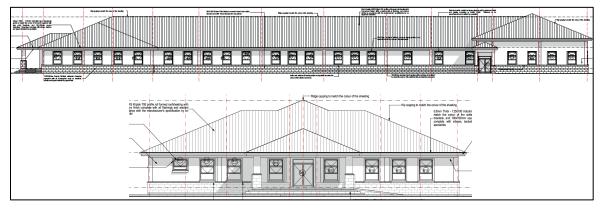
Side Elevation and Elevation Viewed from Campus Center (Not to Scale)
